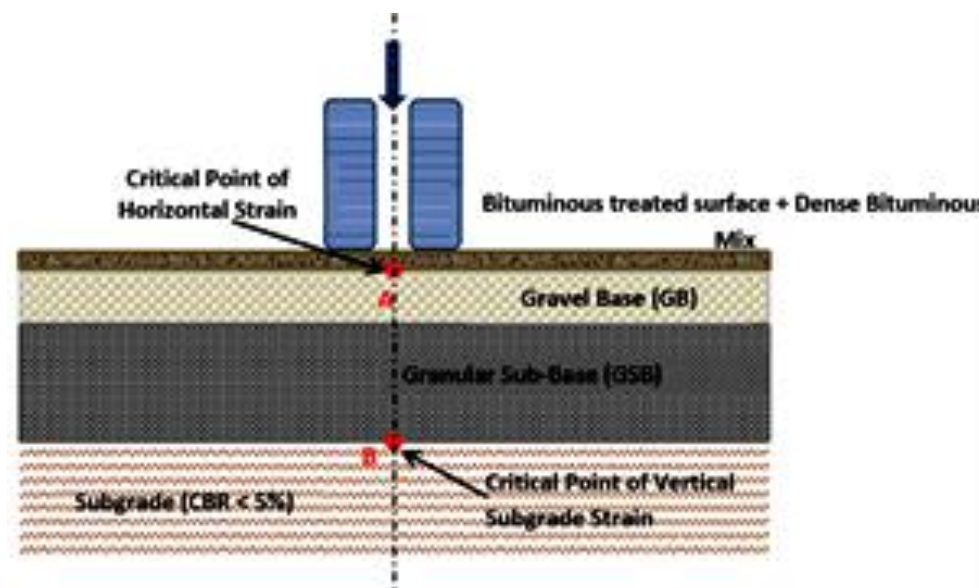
Critical strain points in a pavement section – Bagli, S (2017)
